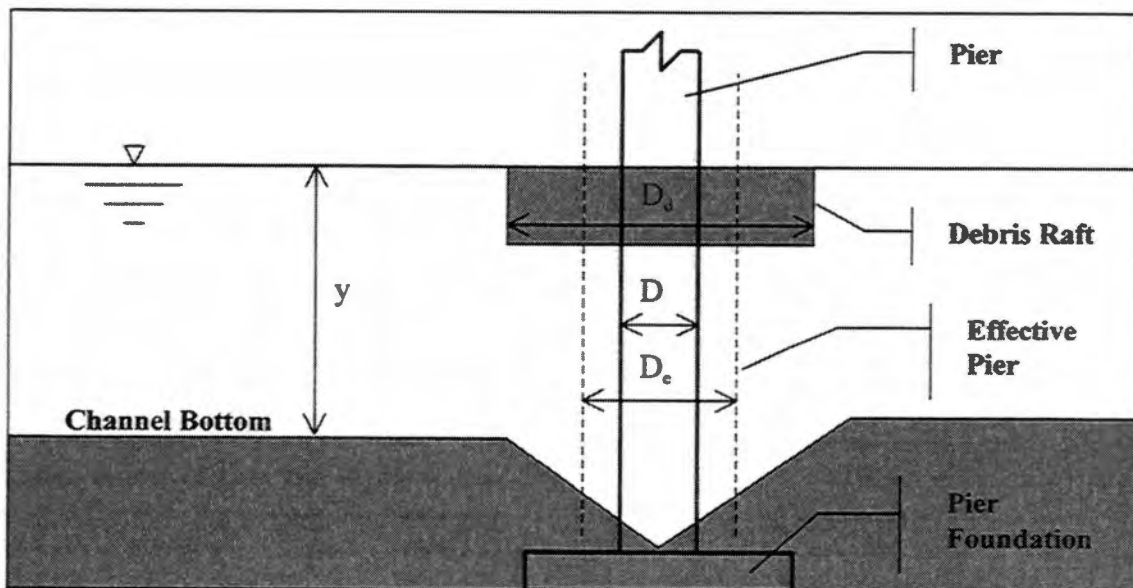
Bridge pier scour with drift accumulation. (adapted from Melville and Dongol, 1992)
